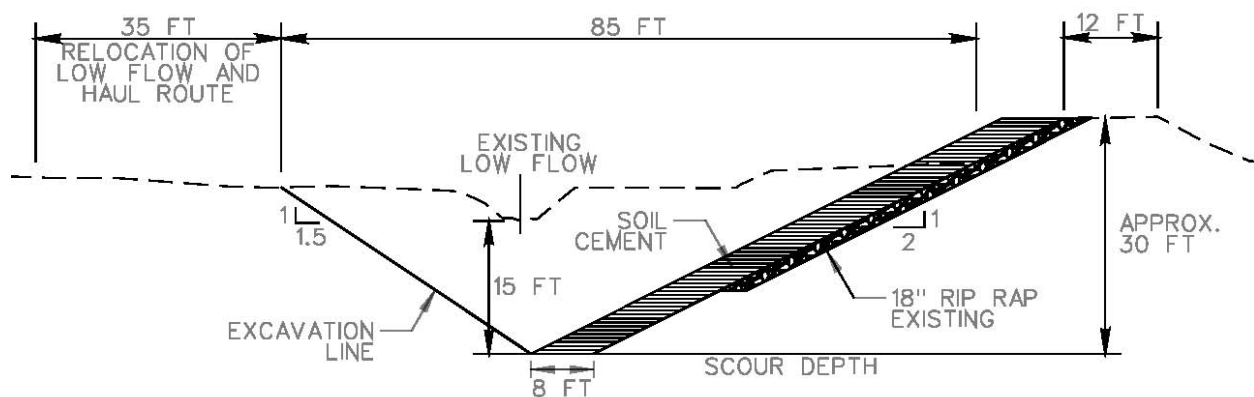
Typical Cross Section of Soil Cement Component
